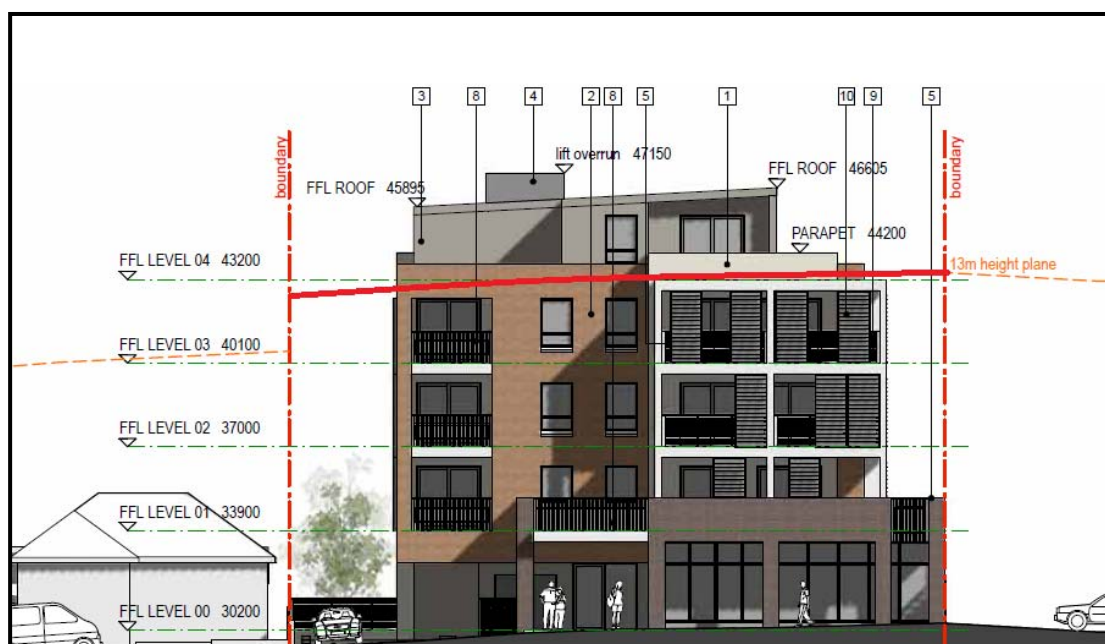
View of the eastern elevation noting the extent of the proposed building height variation.
